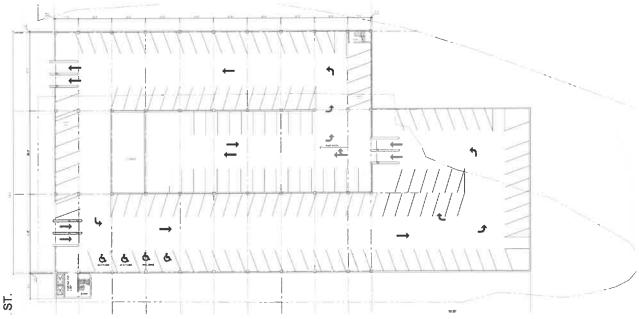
Hewitt Parking Structure Single Access Design Alternative
